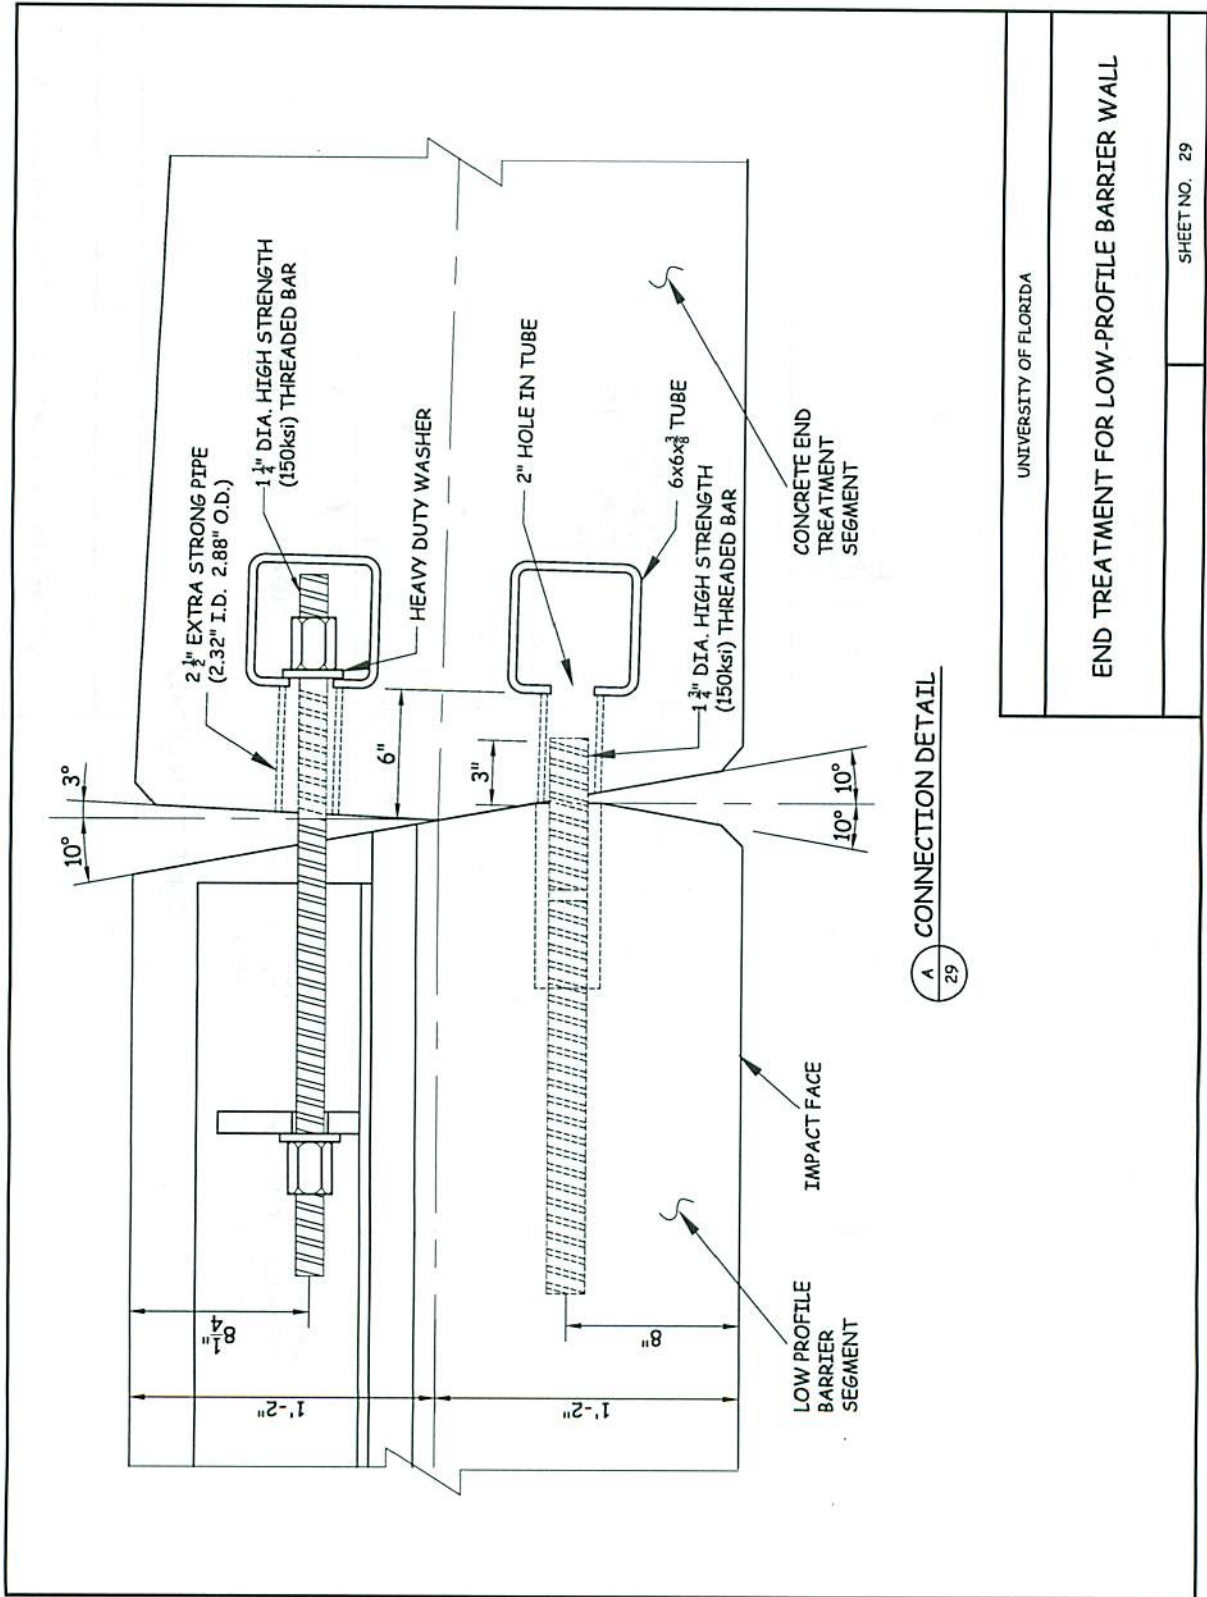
Drawings of Florida Concrete Curb End Treatment (13 of 14)
